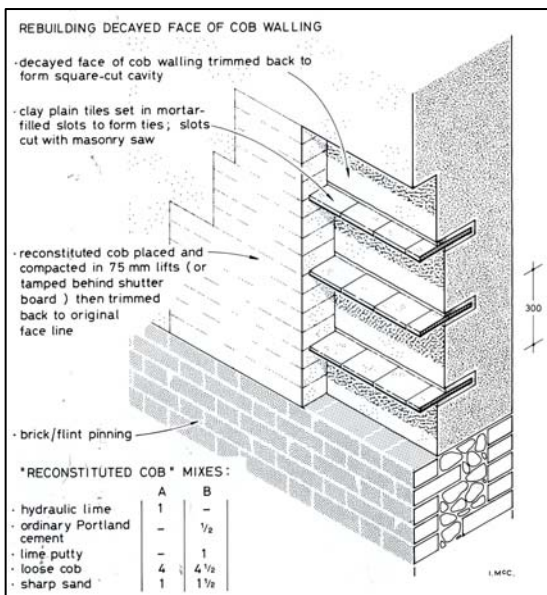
Illustration showing how to repair a cob or pisé wall with cutting out, temporary shuttering, and filling in. (Image: John and Nicola Ashurst)
